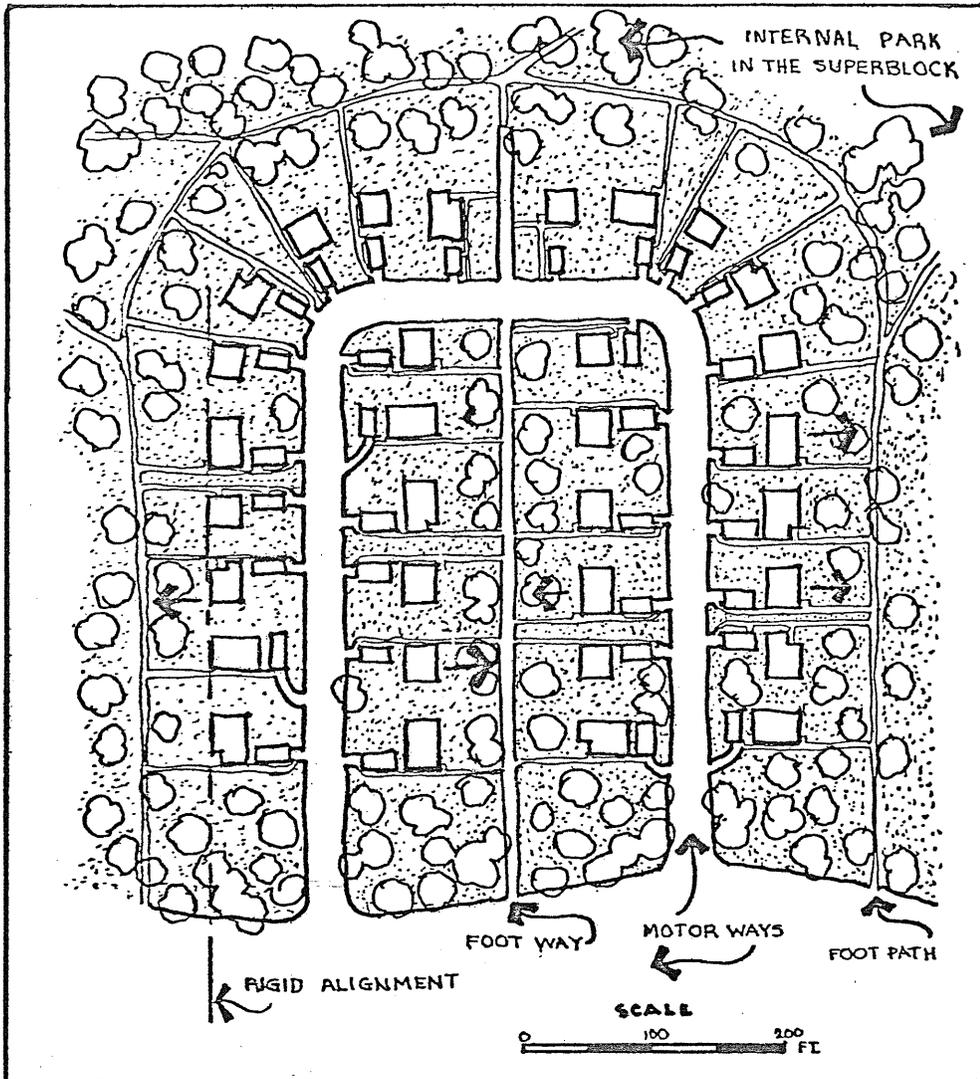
A Typical Loop in the Wildwood Plan (Kostka, 1957:107)
